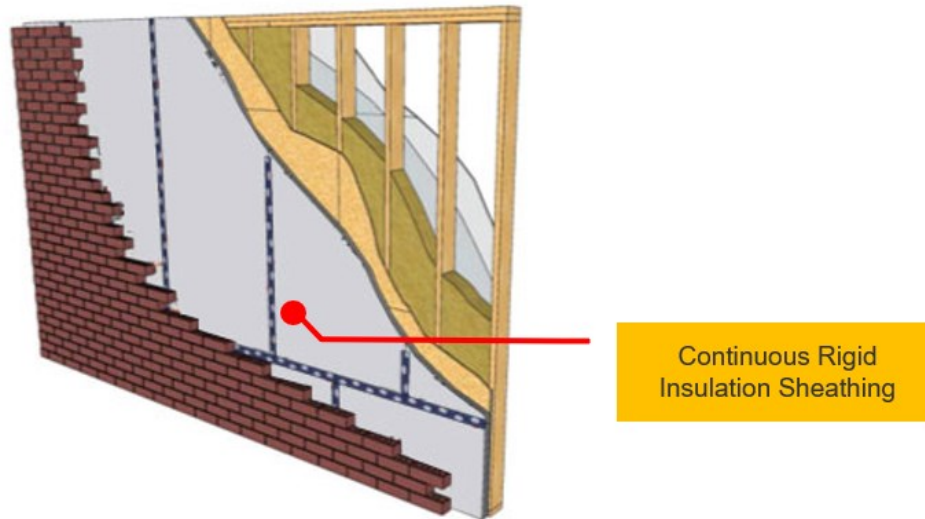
Wood Frame Wall Section(Rigid Board Installation Builder's Guide, 2018)
